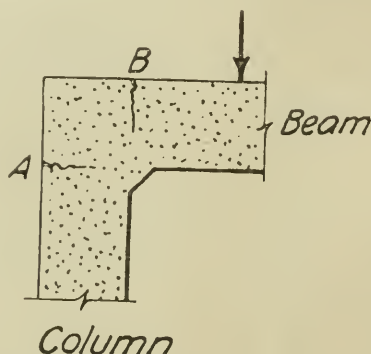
CONNECTION OF BEAM AND COLUMN SHOWING TYPICAL LOCATION OF FIRST CRACKS
